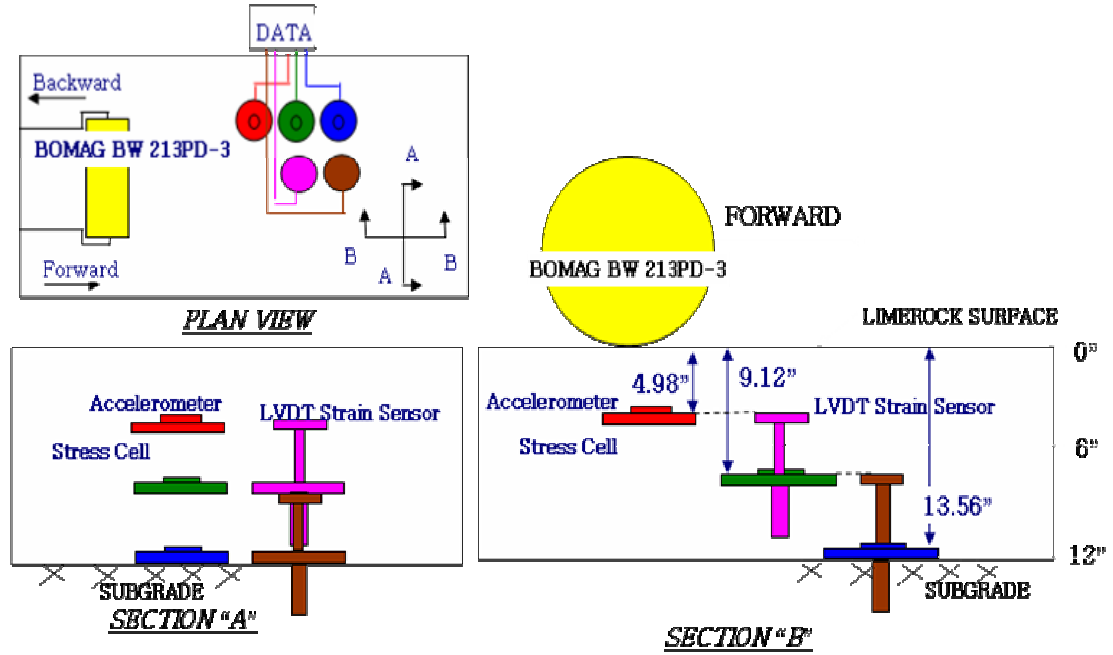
Section 2 Instrumentation – Single 12-inch Thick Lift, Pad-Foot Roller
